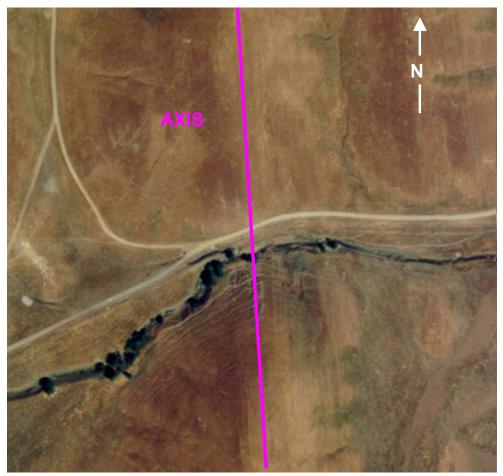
Aerial view of Prohibition component of Hunters Dam site
